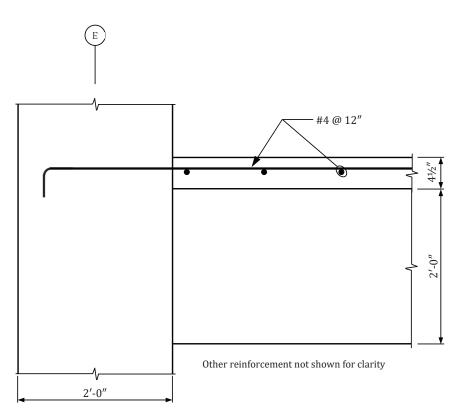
Shear transfer reinforcement between the diaphragm and the special structural wall along column line E in Example 14.13 for seismic forces in the east-west direction.
